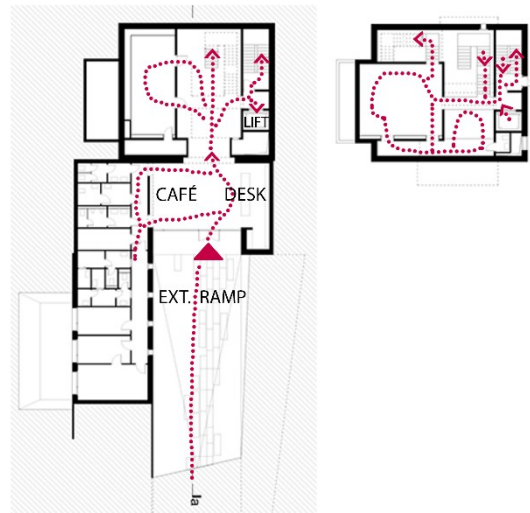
Kemes Volcano Park, Hungary: Floor plans. (Source: Floor plans by Foldes Architects with markings by Filová, 2021)
